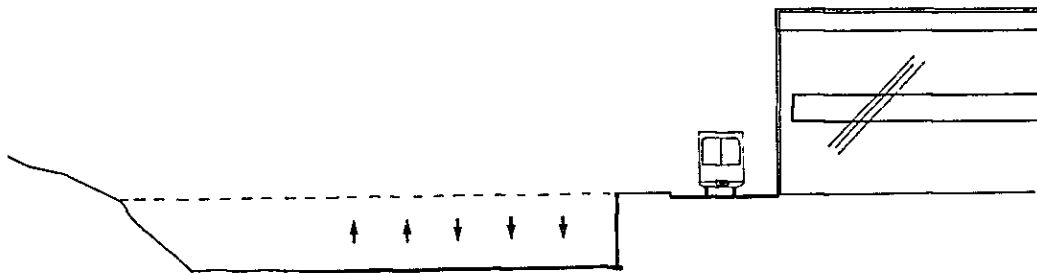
EXISTING CROSS SECTION OF VIA CERRO ANCON(2)
